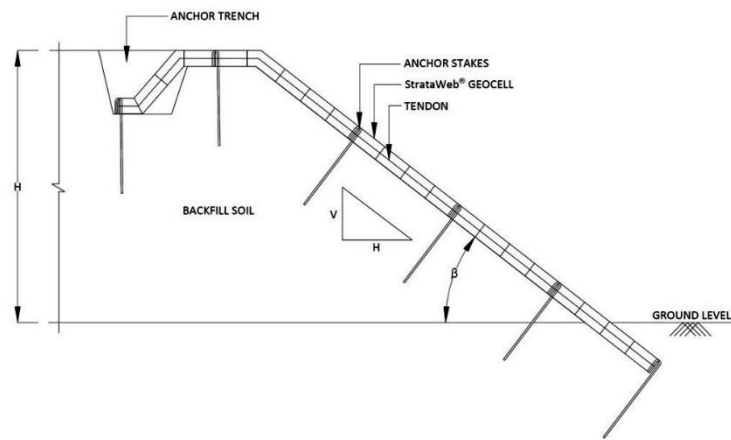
Typical cross section of embankment slope with geocell for slope erosion protection
